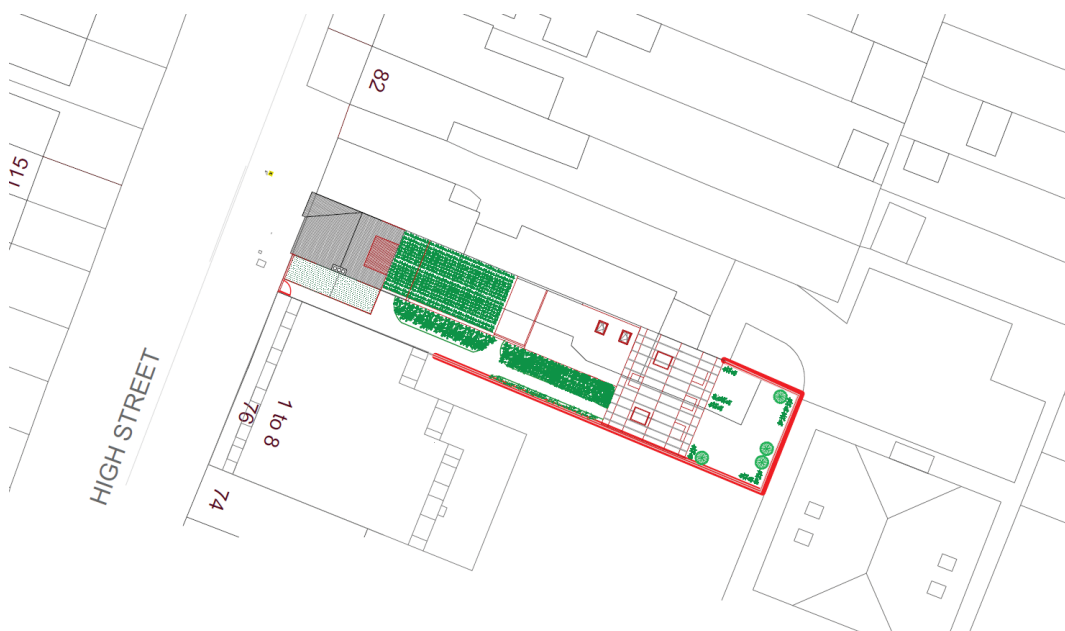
Proposed Ground Floor Plan (please note – larger version of plan can be found in the Committee Plan Pack)
